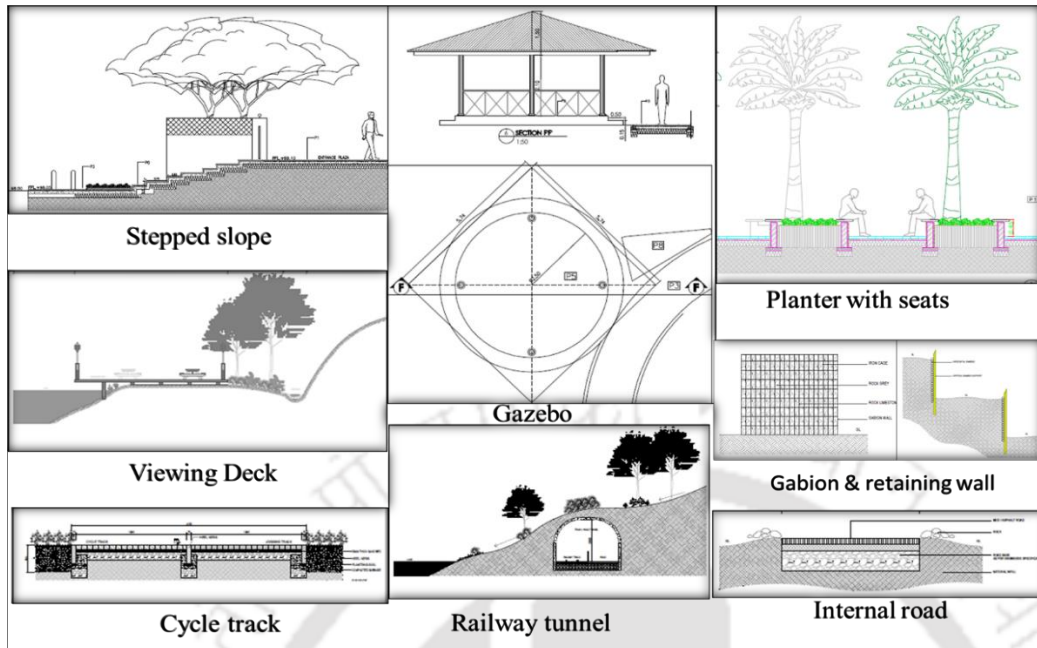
Proposed hardscape details (Drawings are attached in Annexure 10)
